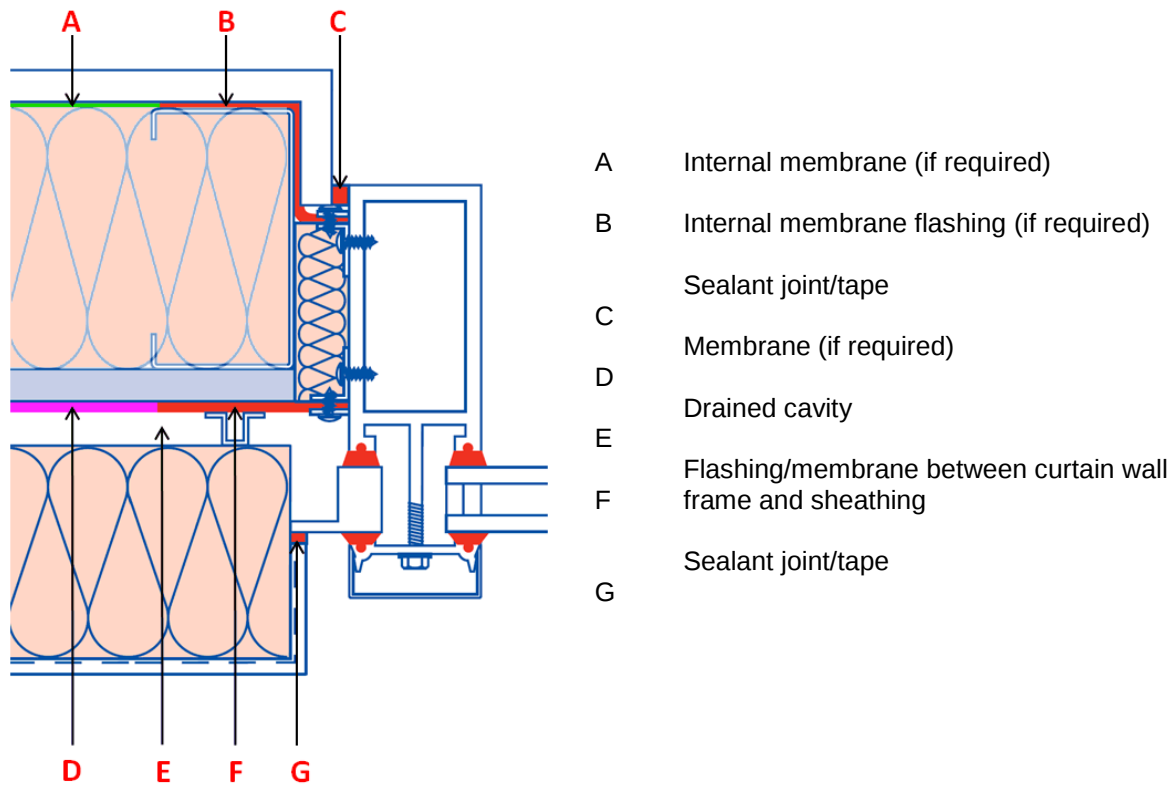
Curtain wall interface with EWIS, framed back wall (insulated)
